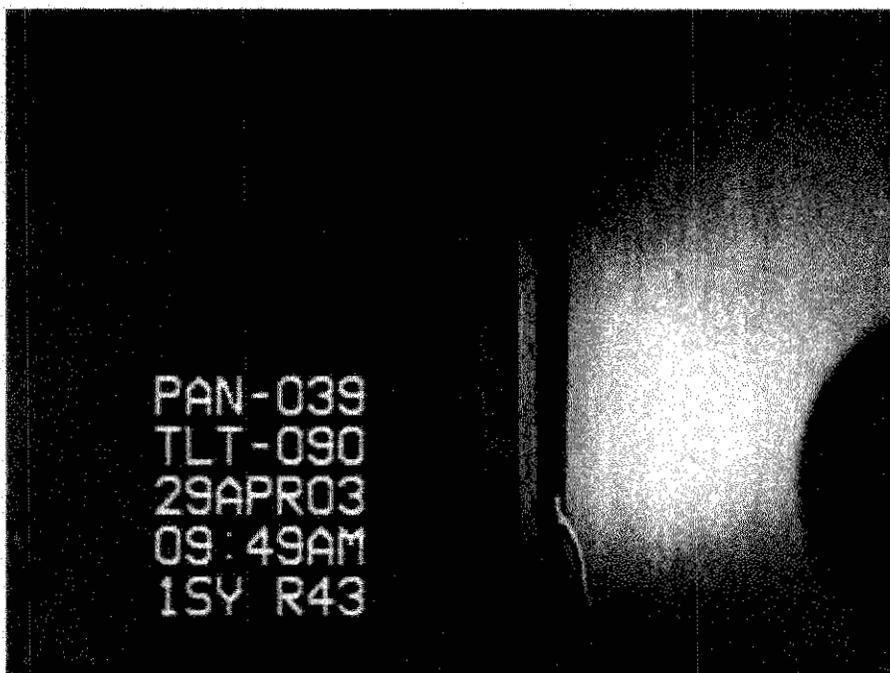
SY-101 Riser 43, Secondary Tank Wall (Left, 2003)
